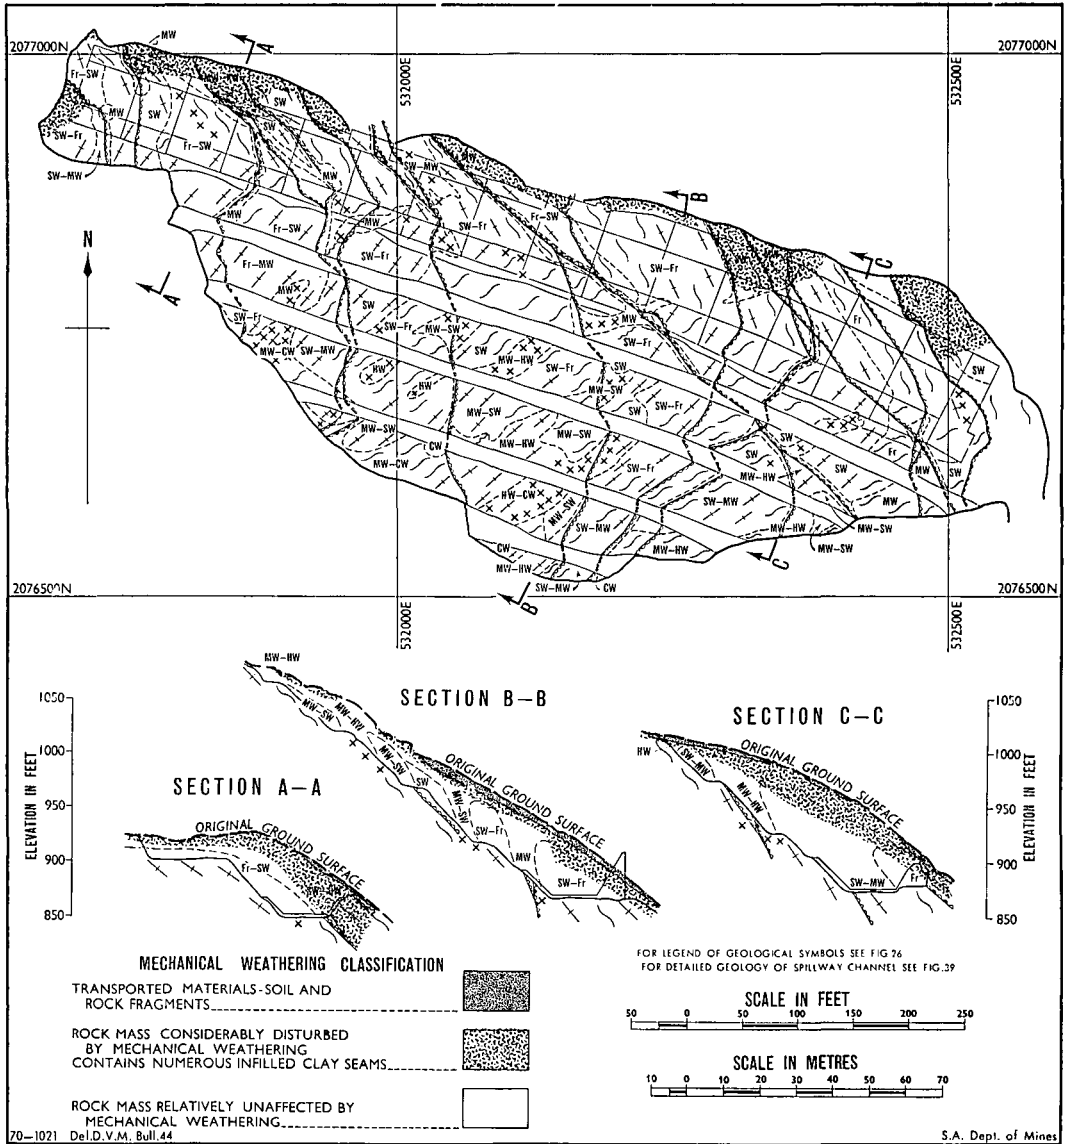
Spillway excavation, rock types and weathering; plan and sections.
